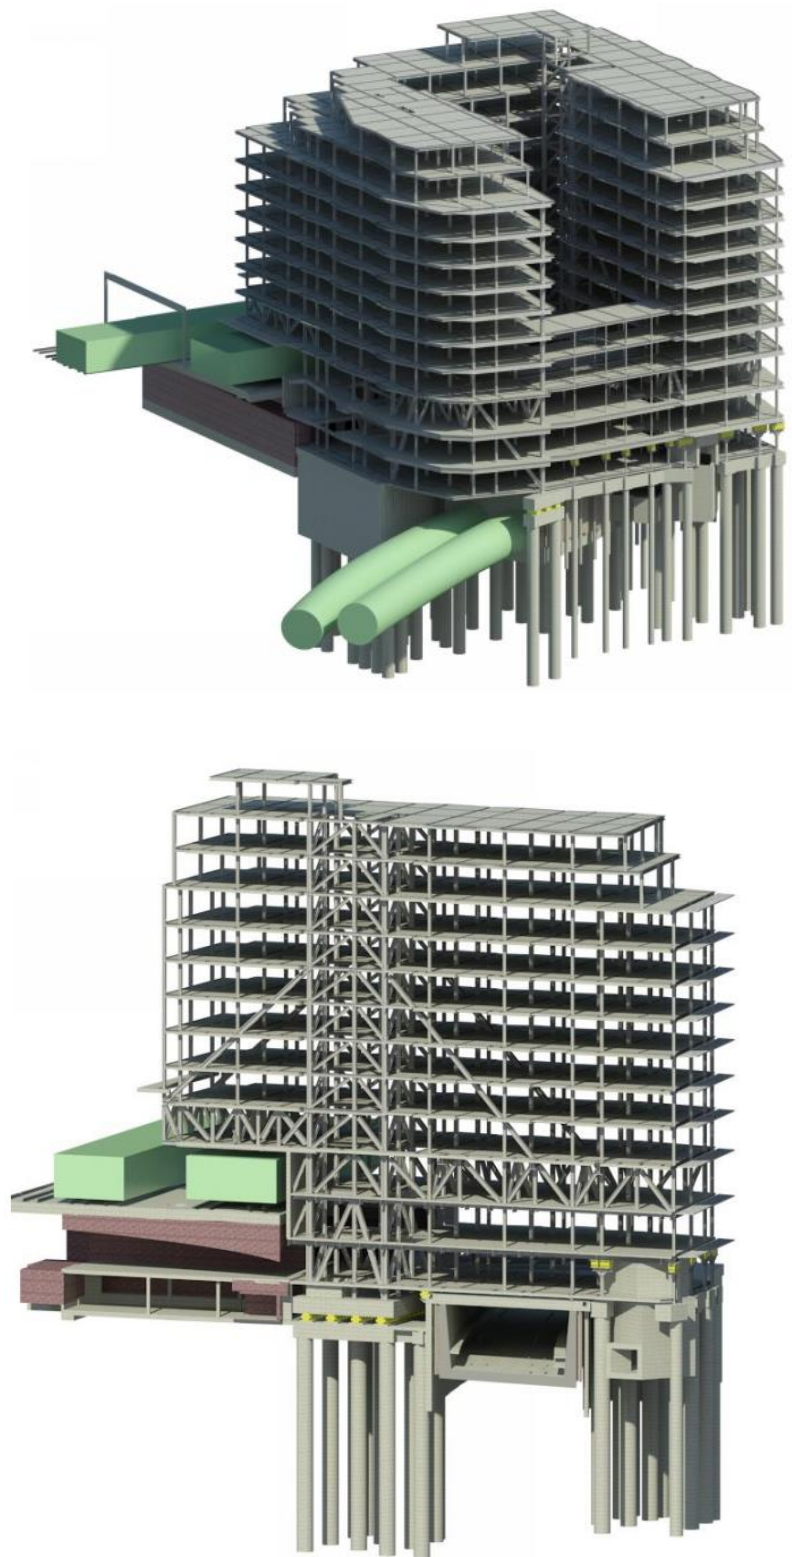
View of proposed development bridging Docklands Light Railway tunnels and Network Rail viaduct (top); cross-section through development showing Docklands Light Railway encapsulation tunnel and viaduct integration into the scheme (bottom).
